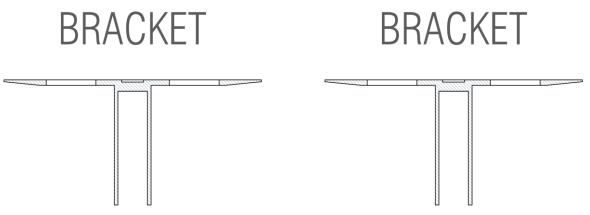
Detail drawing of the façade system's brackets and profiles [drawing created using AutoCAD]
